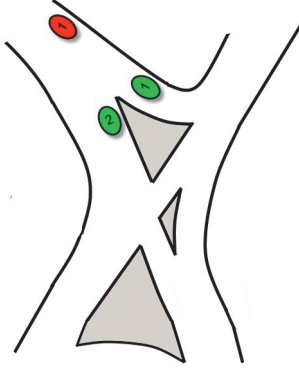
Road intersection 4 with incoming and outgoing traffic sections
